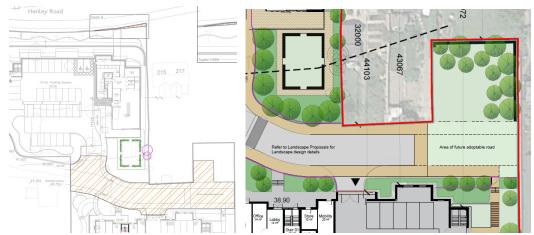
Left: Extent of carriageway for adoption (left). Right: Extract of site plan until such time development comes forward to the east (if at all)
